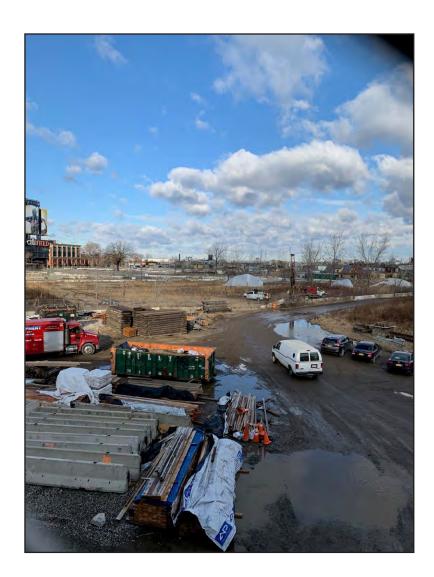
Overview of the Tully Site from Roosevelt Avenue.
